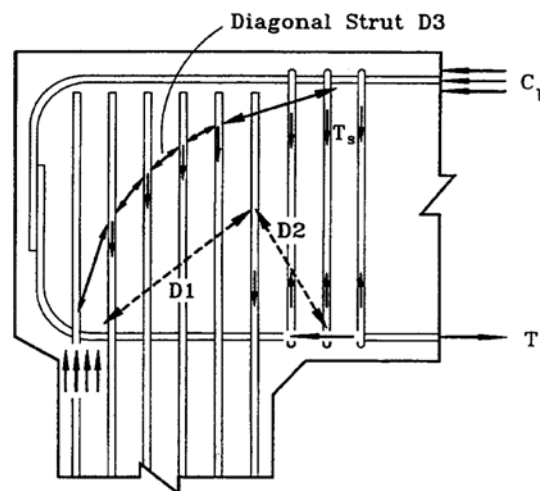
External Vertical Joint Reinforcement for Joint Force Transfer.
